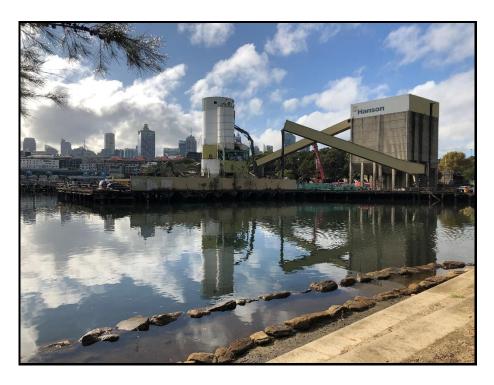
Looking southeast from the foreshore towards the north western boundary of the site.
